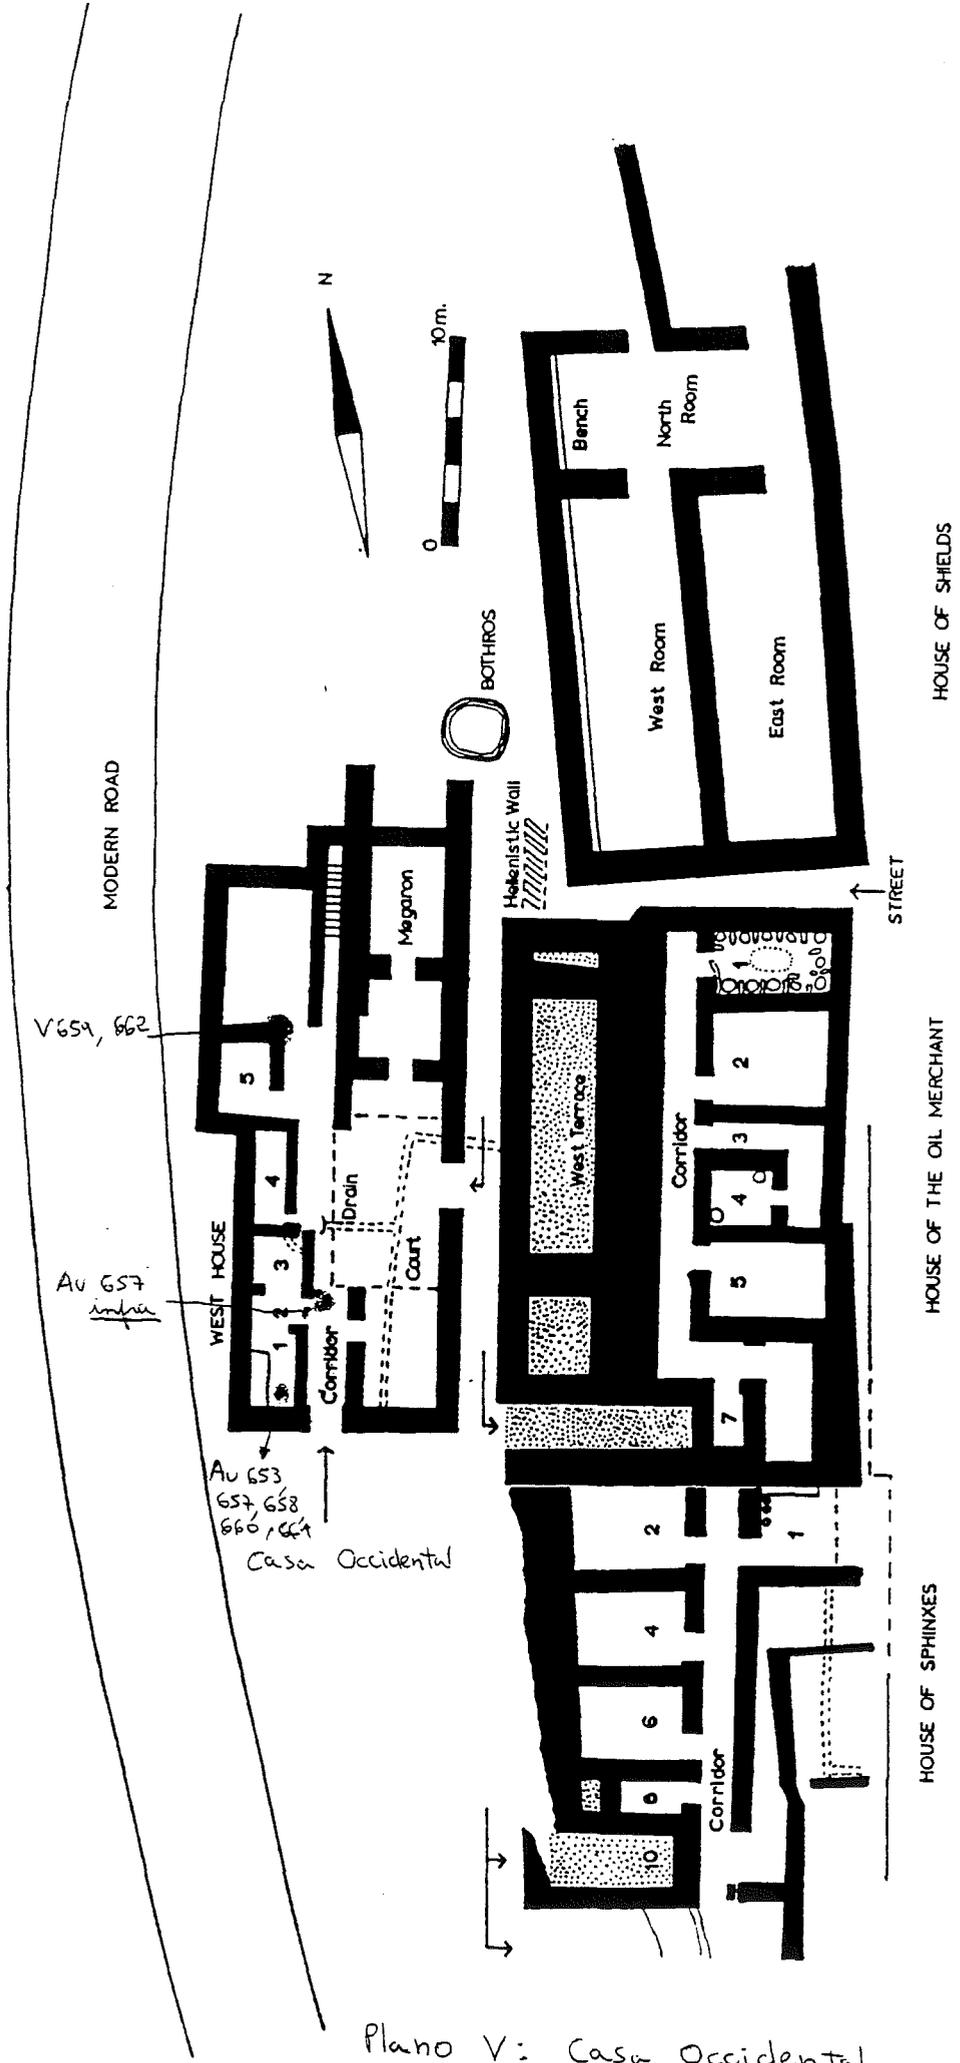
PLAN OF THE HOUSES TO SHOW FIND-SPOTS OF POTTERY
